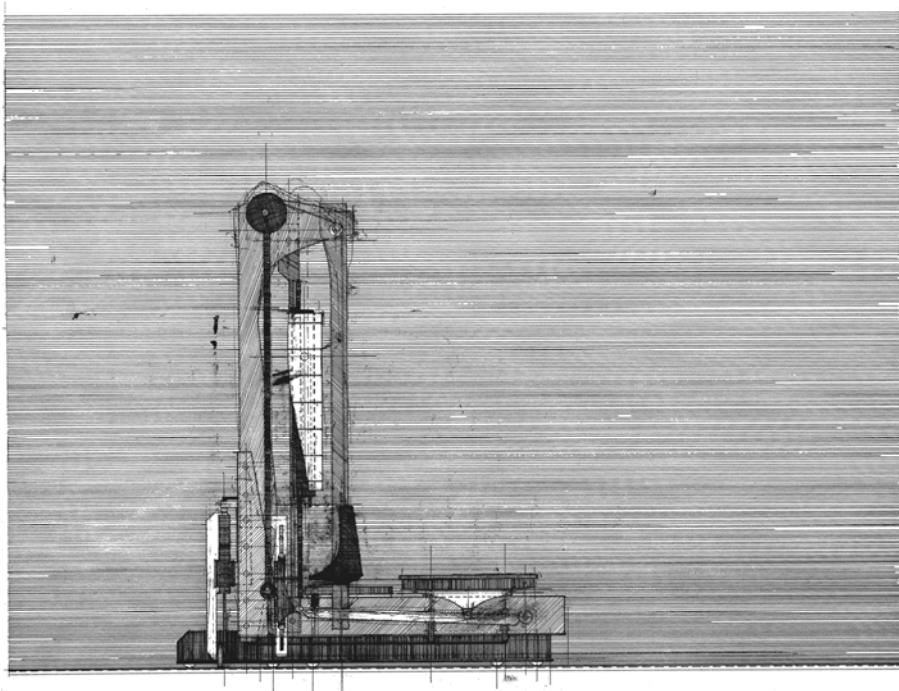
Guess-your-weight machine for promenade, elevation drawing.
